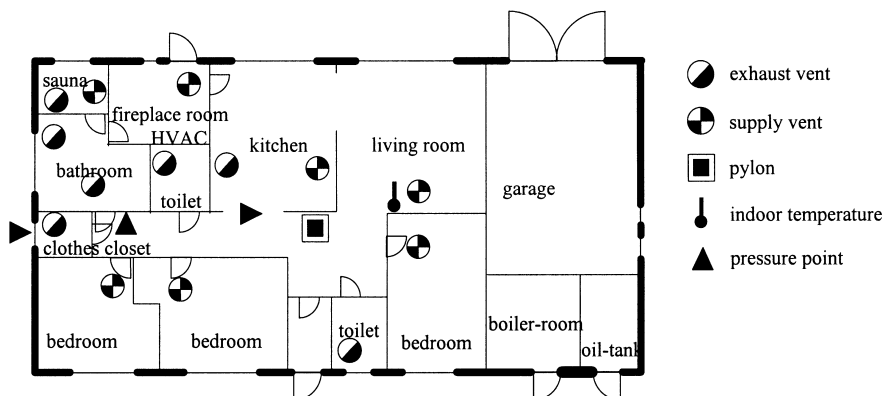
Floor plan and sampling points of basement of the slab-on-grade house (A).
